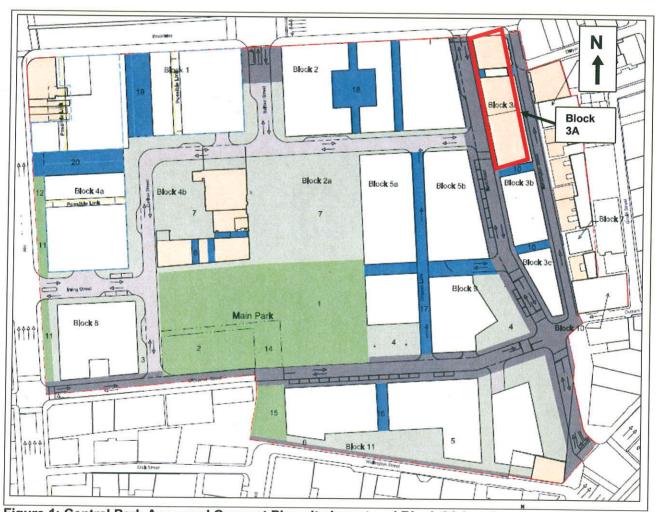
Central Park Approved Concept Plan site layout and Block 3A location
